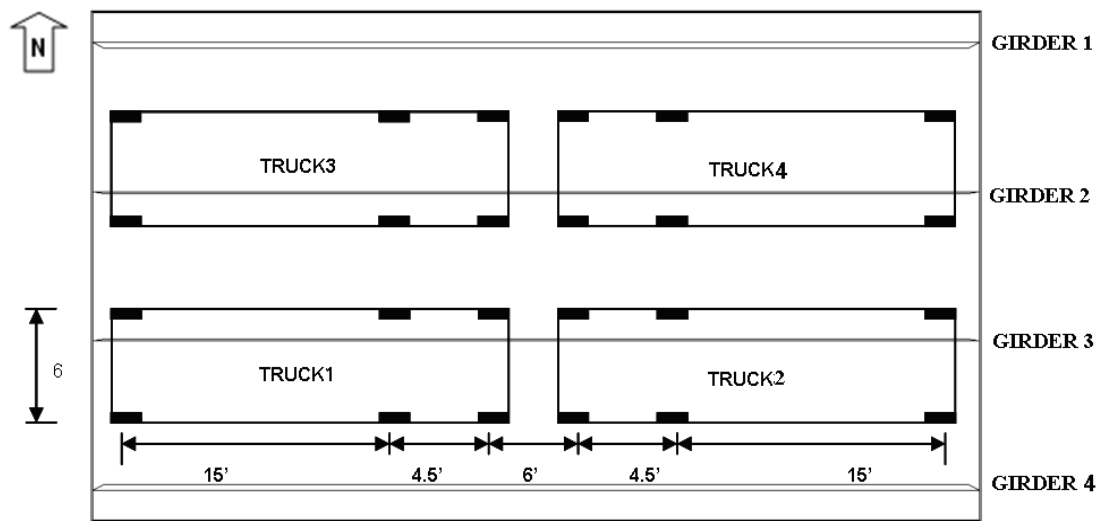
Placement of Trucks for Dawson County Bridge Load Test
